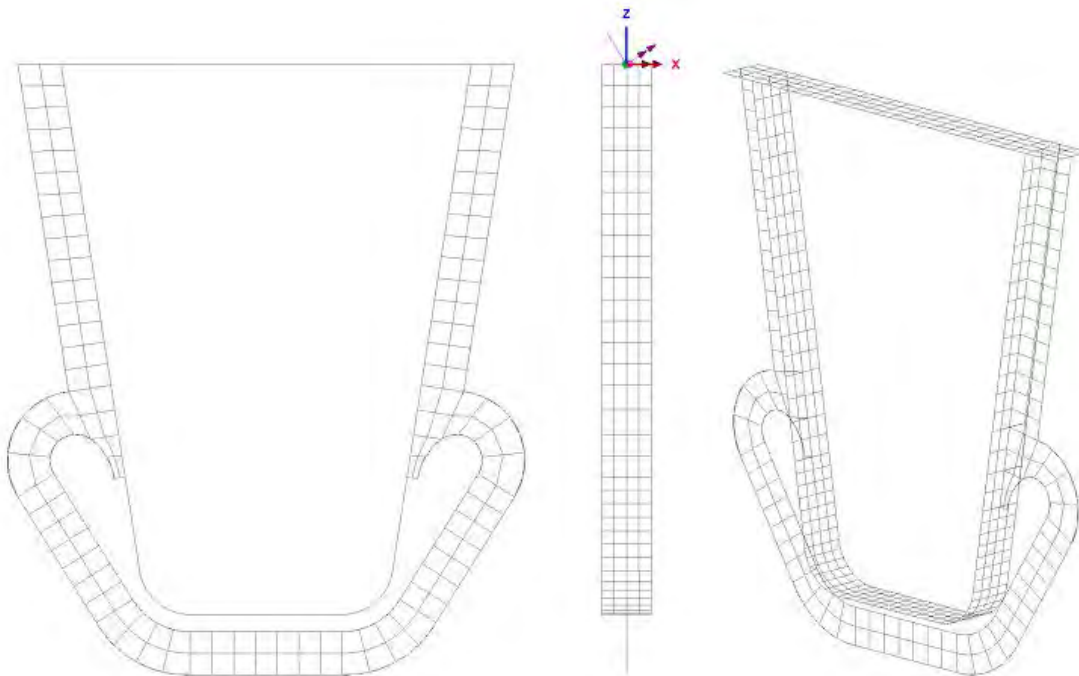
Close-up of Detailed Section with Deck Removed to show how the individual Girder, Floorbeam, and Rib Element have been Modeled. Gray Areas Indicate High Mesh Density
